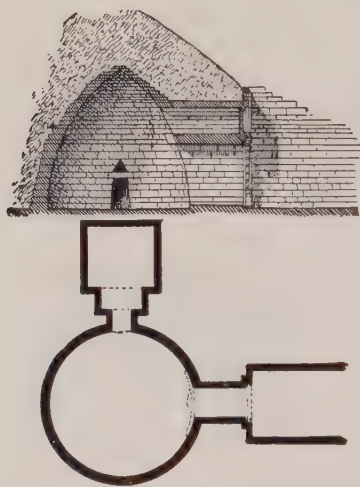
THOLOS OF ATREUS. PLAN AND SECTION.
